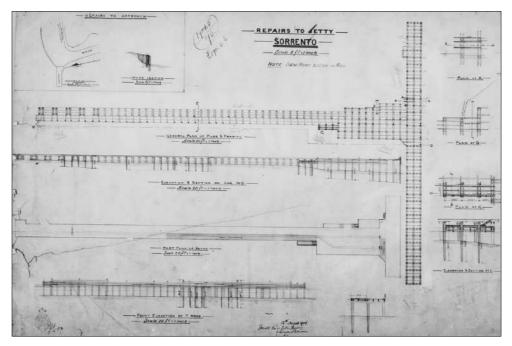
A 1904 plan for repairs to the Sorrento Pier, also appearing to involve pile replacement as well as new planking. Source: Parks Victoria.
